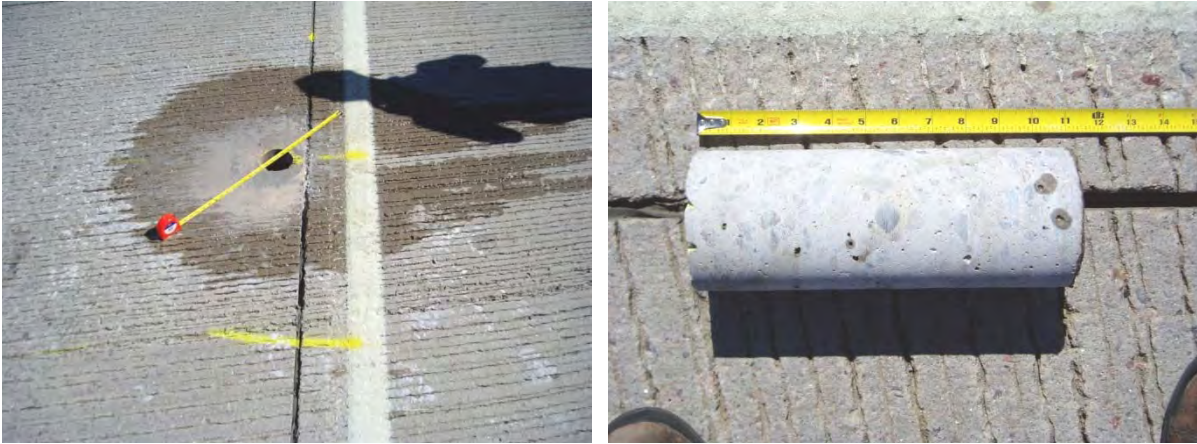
Diagonal orientation of tie bar across joint (left) and the 11-in. core (right).
